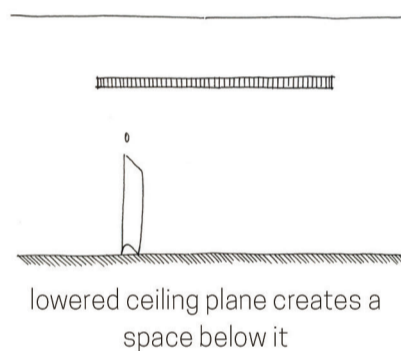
Flat ceiling plane (Author, 2016)
